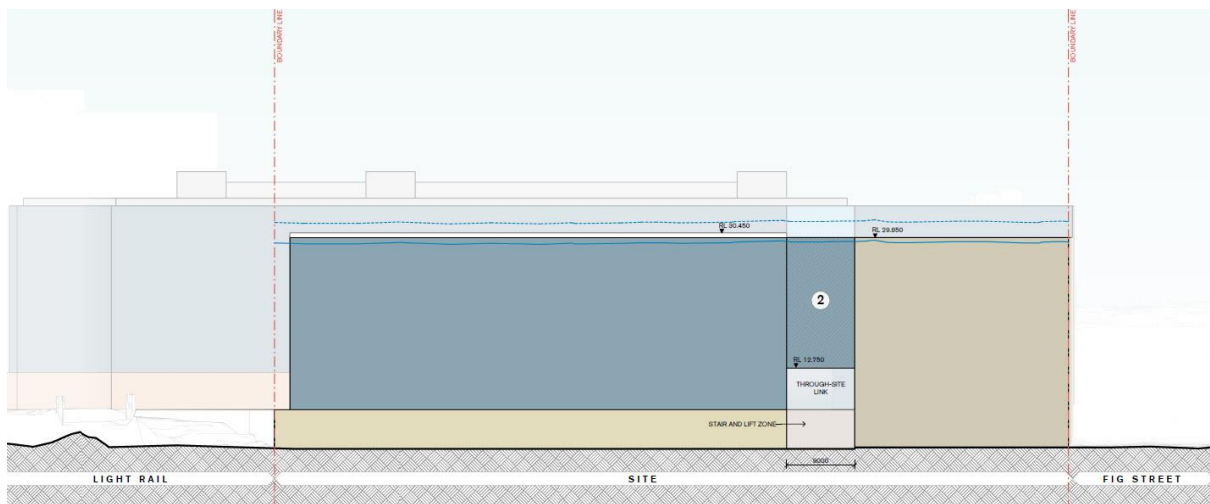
Concept Envelope Elevation - Wattle Street (west)
